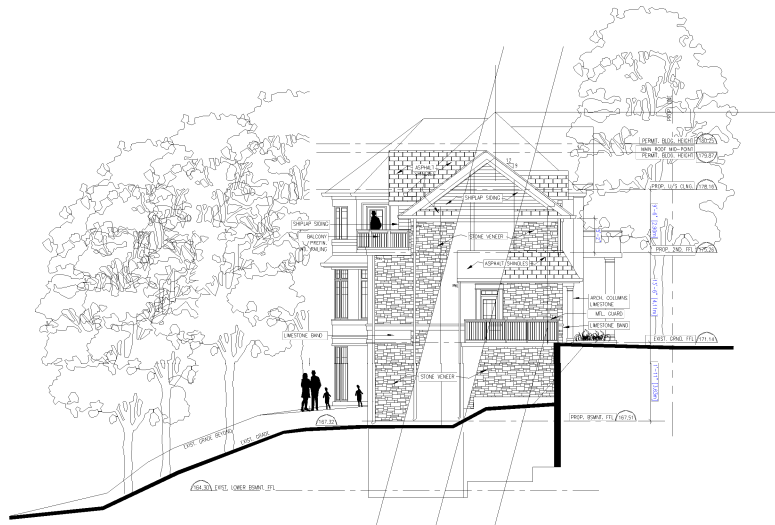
West Elevation for proposed new dwelling. This elevation will be minimally visible from the public realm.
